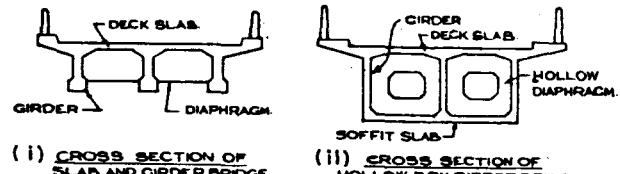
SLAB AND GIRDERS BRIDGE
